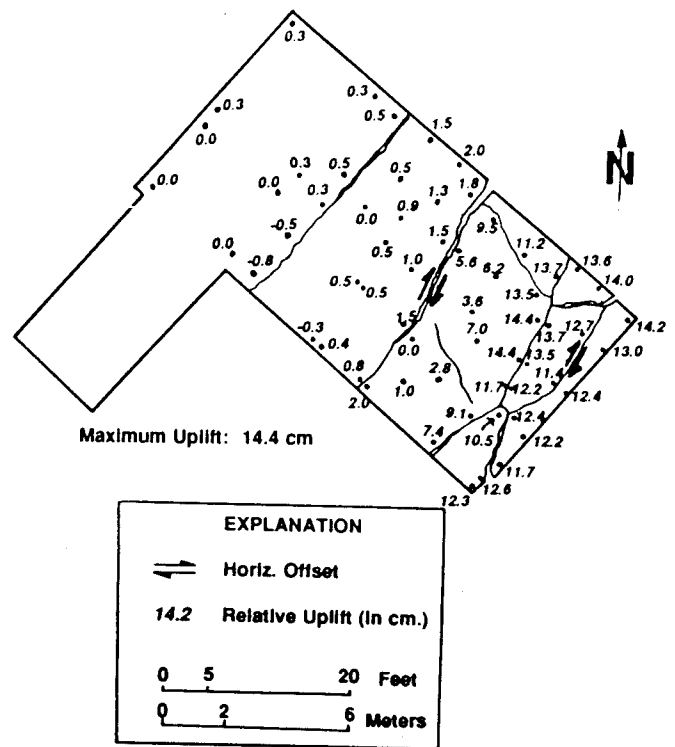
Relative vertical uplift of blocks formed in the cracked unreinforced concrete slab at the Kickapoo Trail site.
